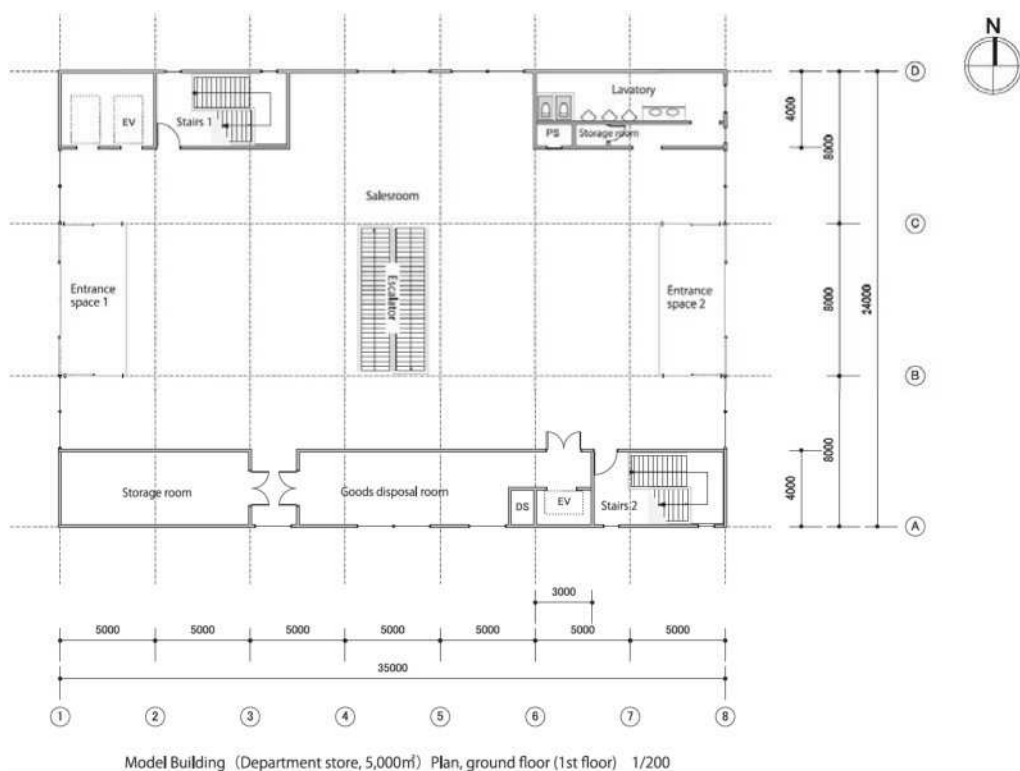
Model building (department store, 5 000 m²) plan, ground floor (first floor) 1/200
